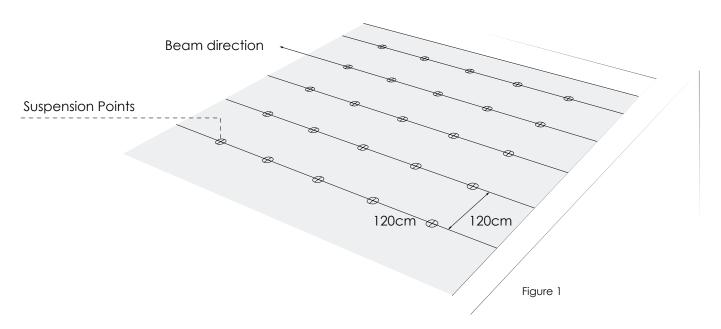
DETAILED SPECIFICATIONS FOR VERTICAL STRIP CEILING
